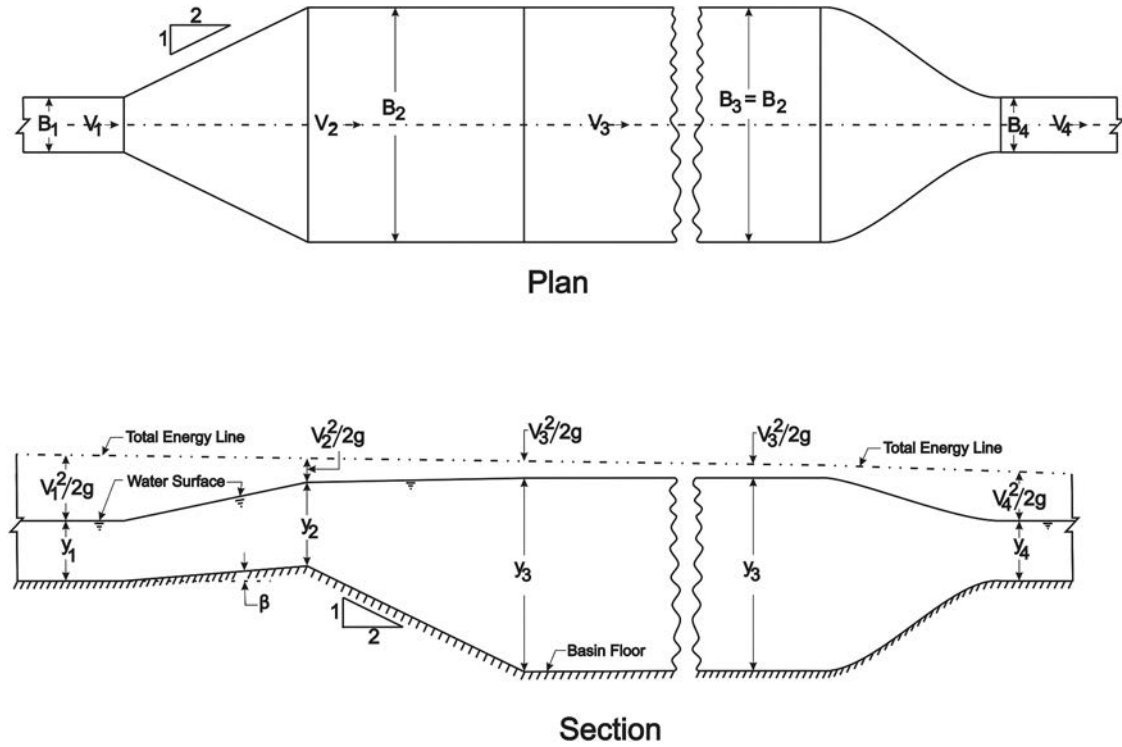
Plan and section of proposed inlet and outlet transition of a settling basin.
